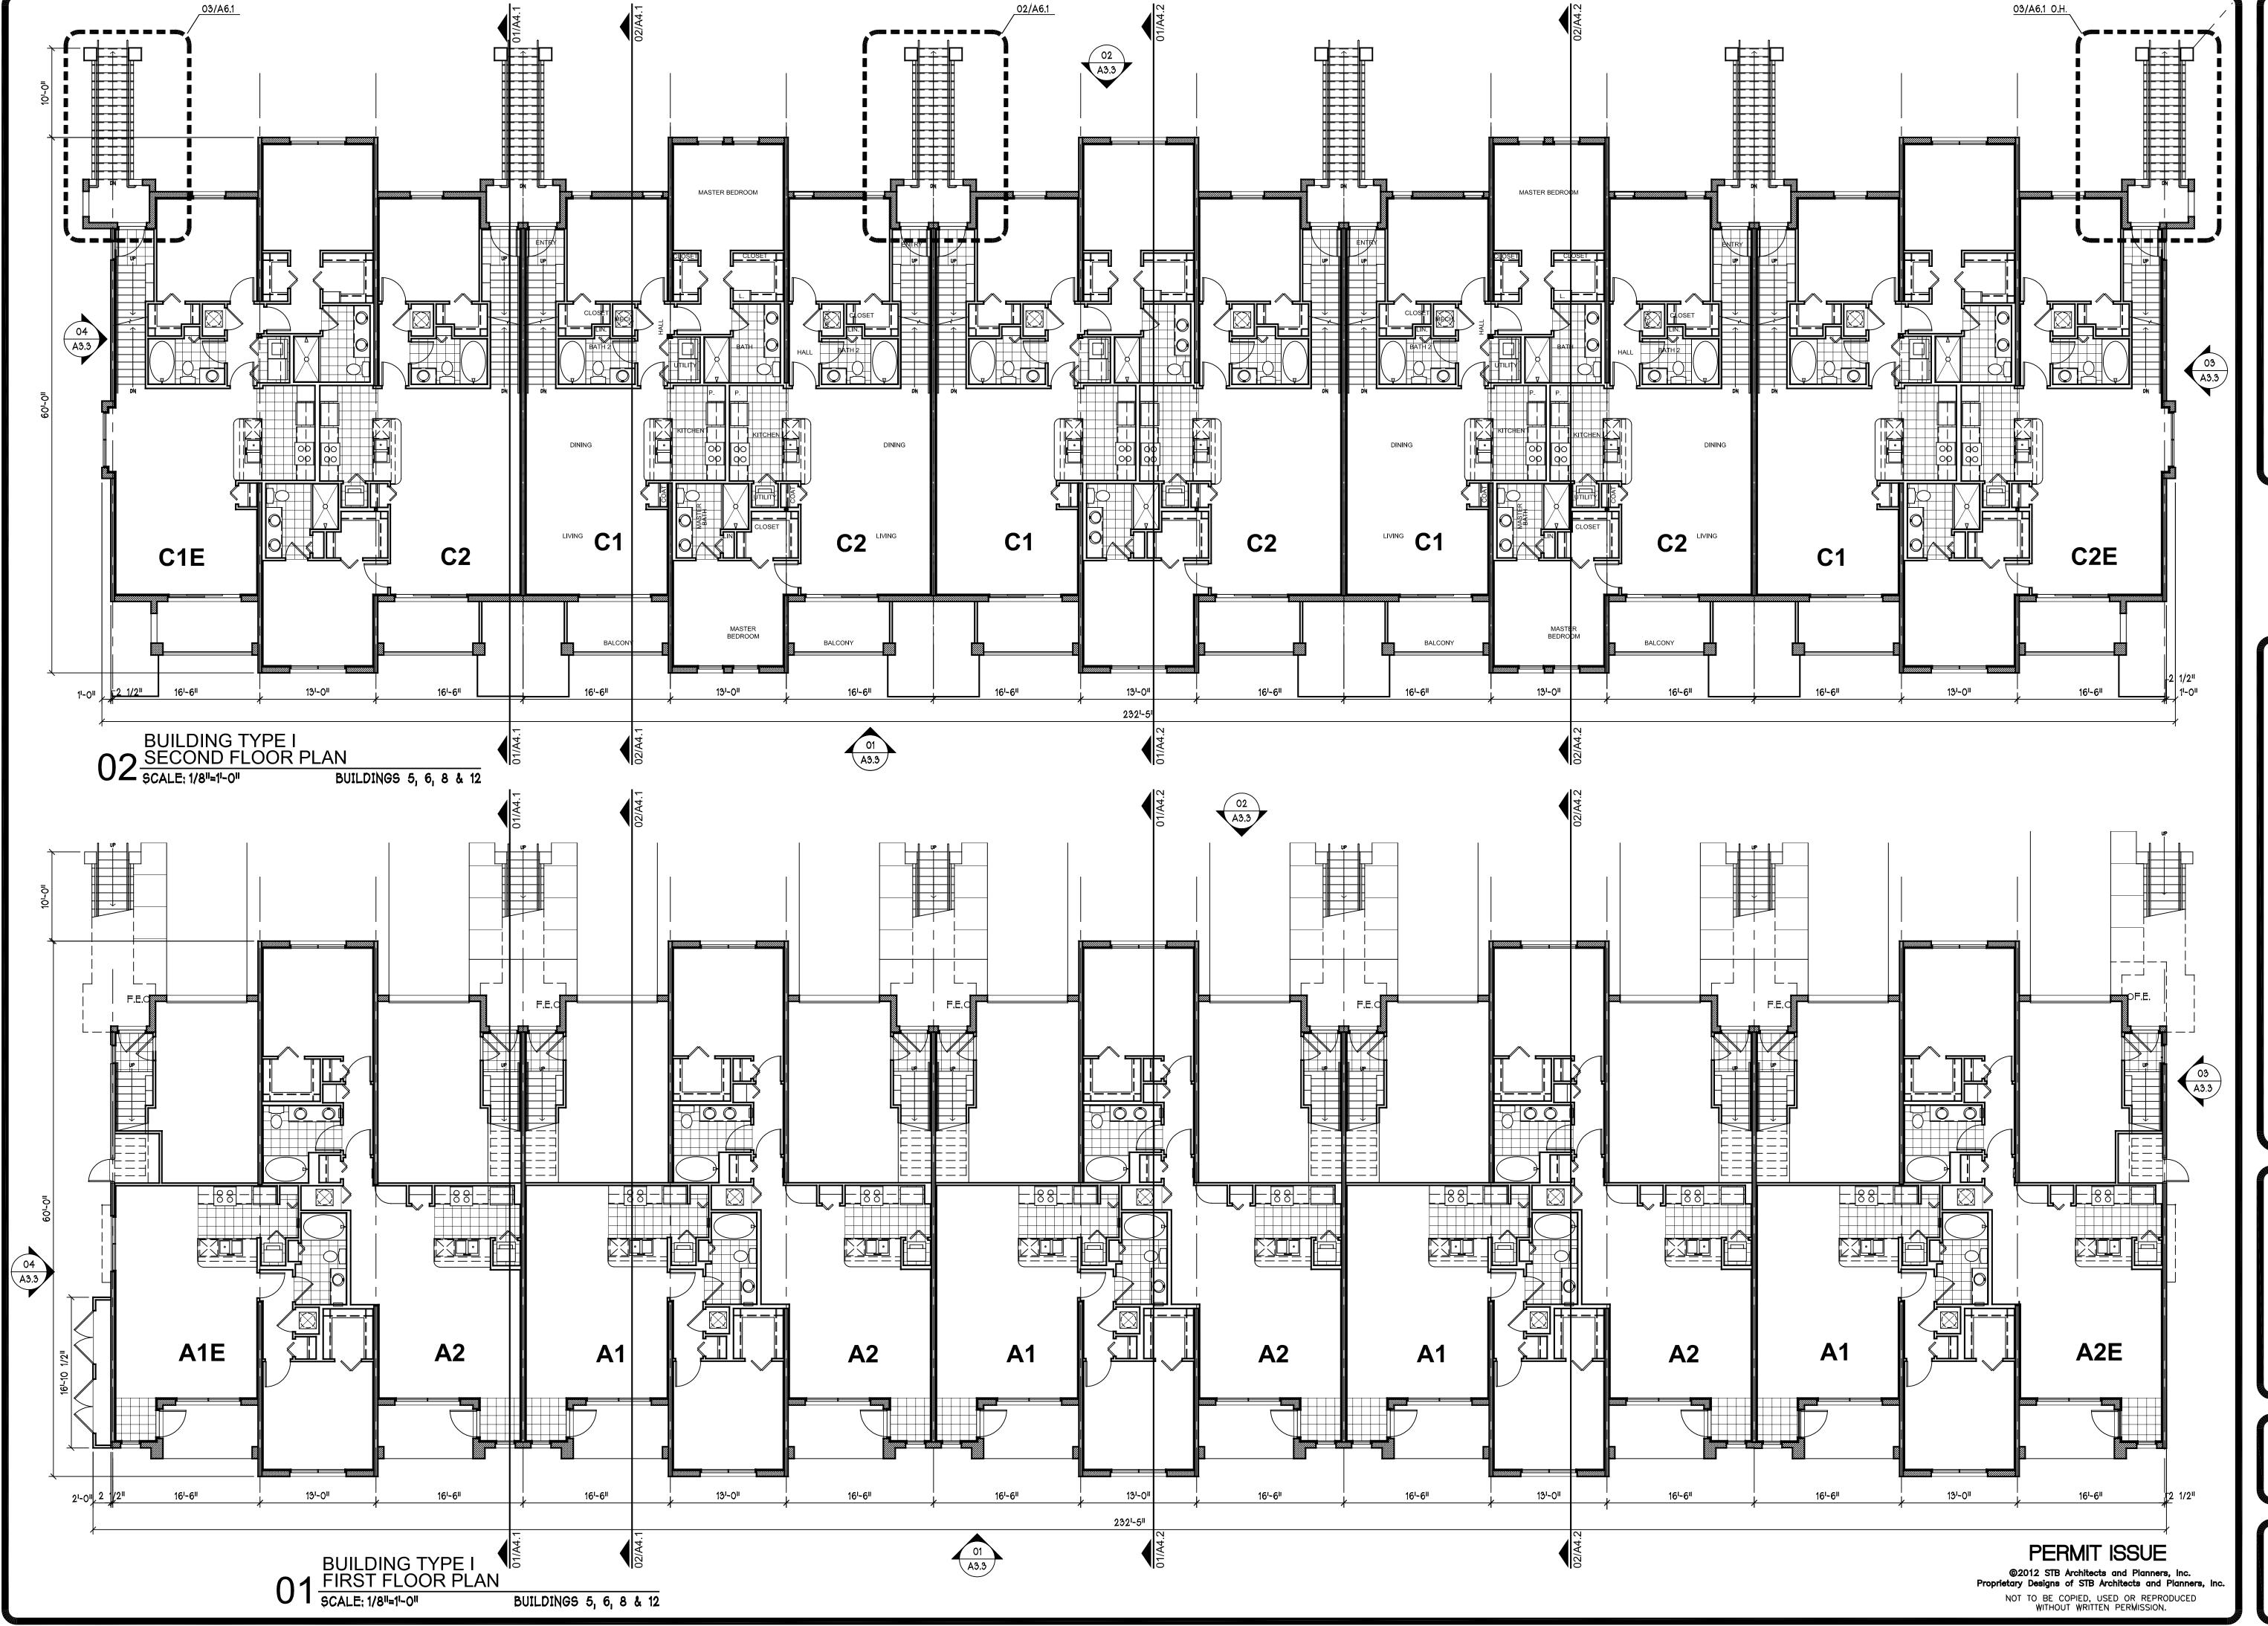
GARDEN APARTMENT BUILDINGS & CLUBHOUSE
